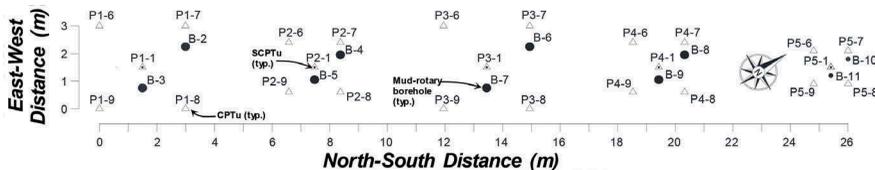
Plan view of the Hollywood test site showing the locations of the various explorations performed (modified from Bong & Stuedlein 2018).
